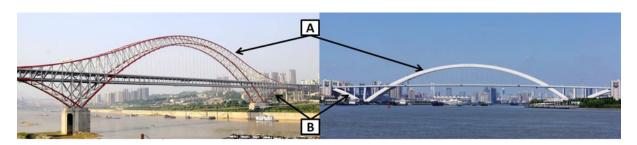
Elements in Fly-Bird type of Through Arch A - Arch ribs, B - Cantilever half-arch ribs, adapted from (Radić, et al., 2016)
